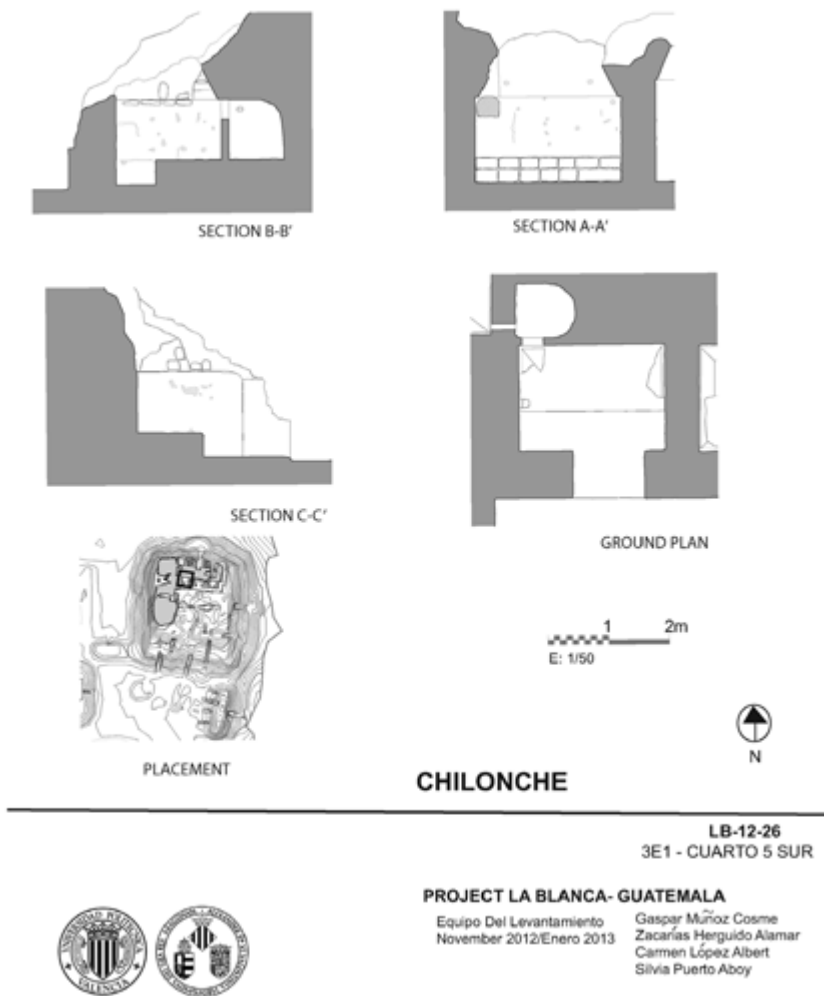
Plan and section of Chilonché Room 5S (Structure 3E1), with a storage place in the rear wall (PLB 2012).
